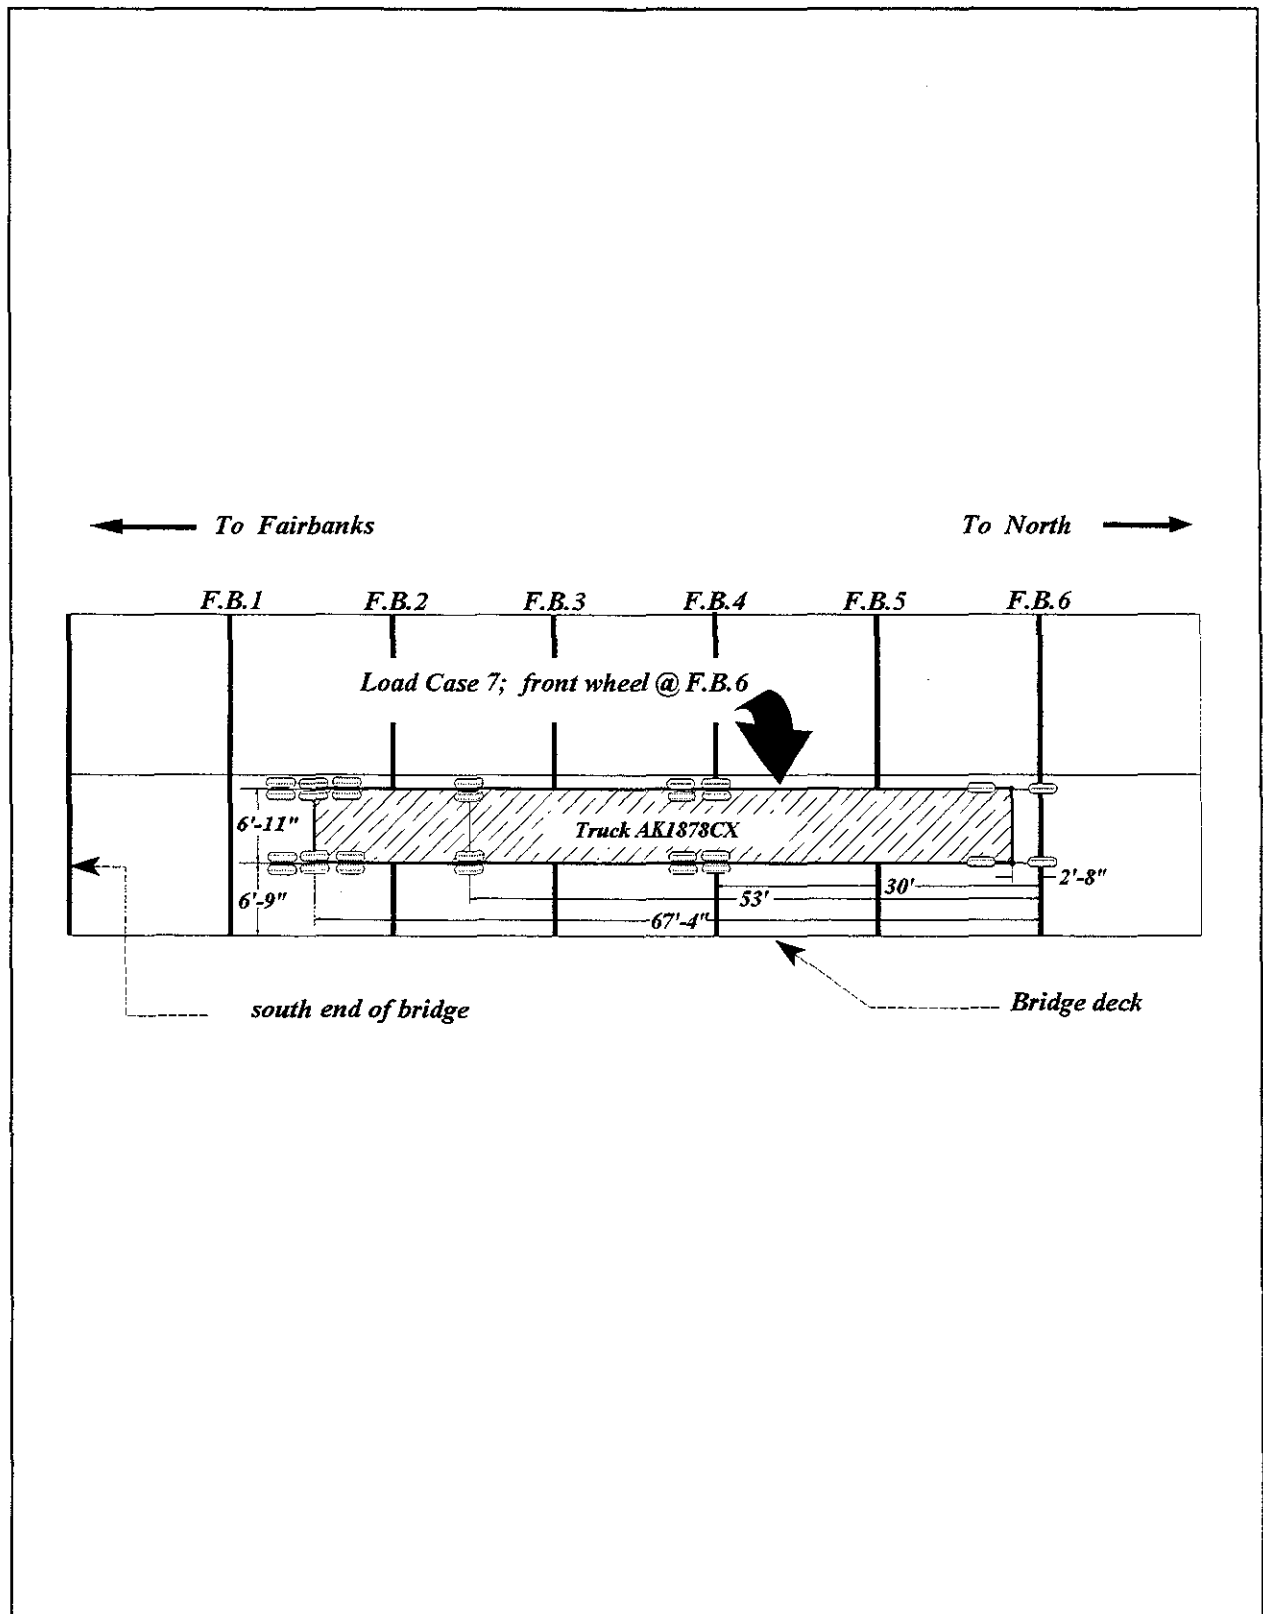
Bridge Deck Static Testing Plan, Test 2
